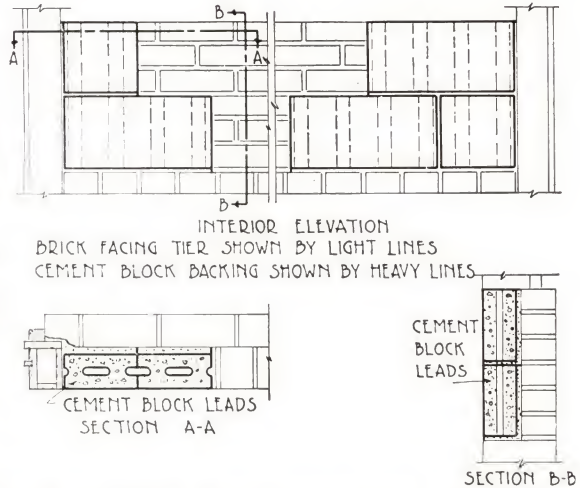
Precast cement blocks used as backing of an 8-inch wall.
